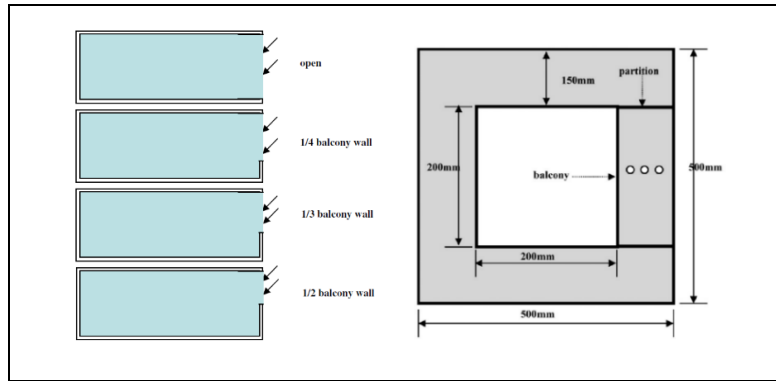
Window Systems at Façade in Atria, Atrium Plan and Measurement Points [53].
